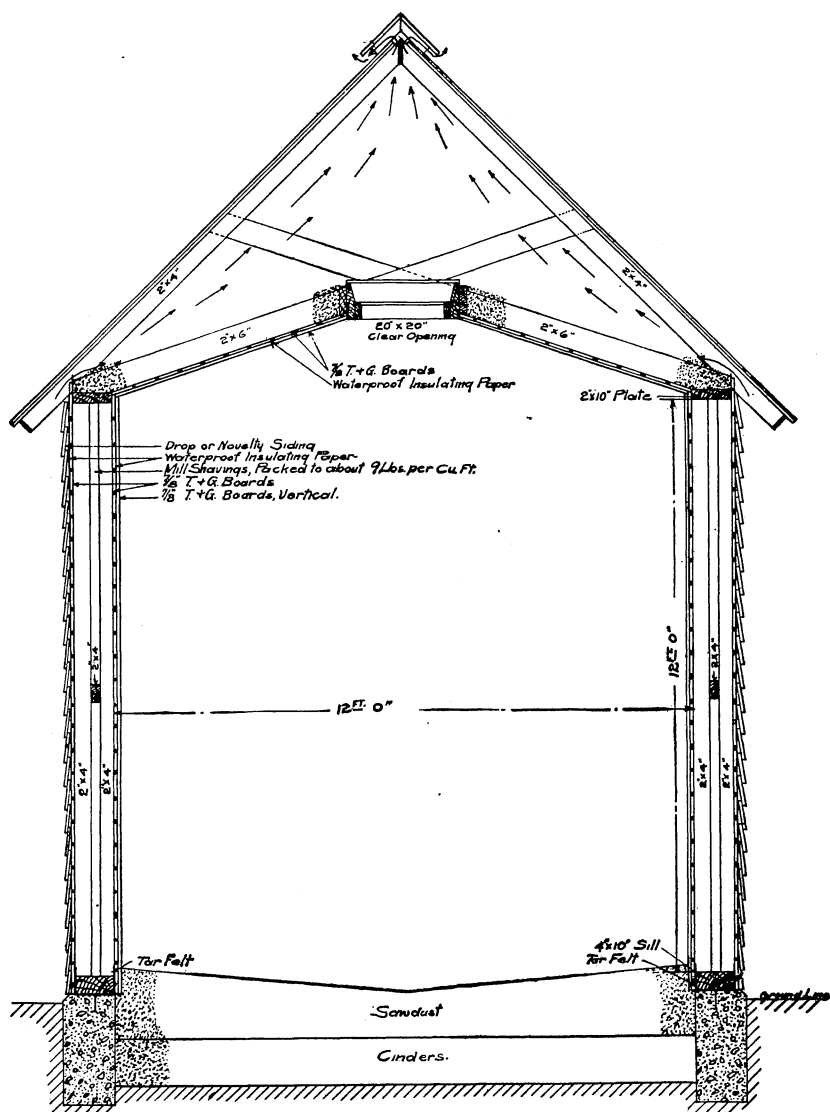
B.—Wooden ice house, insulated with sawdust or mill shavings. (Section on C-D of fig. 19a.)
